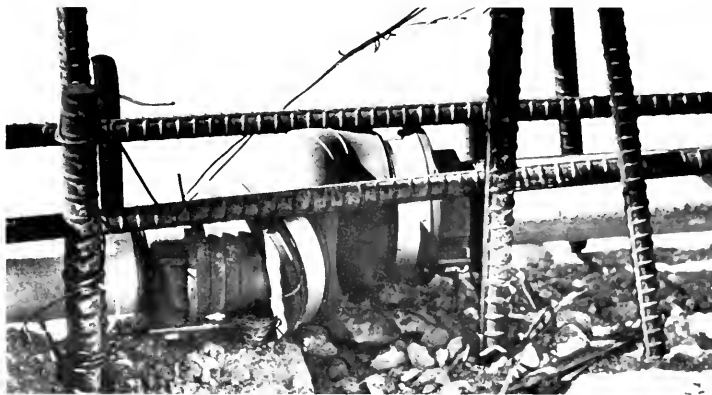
Buckled flexible splice in steel conduit, Santa Clara overhead crossing on State Highway 14.
